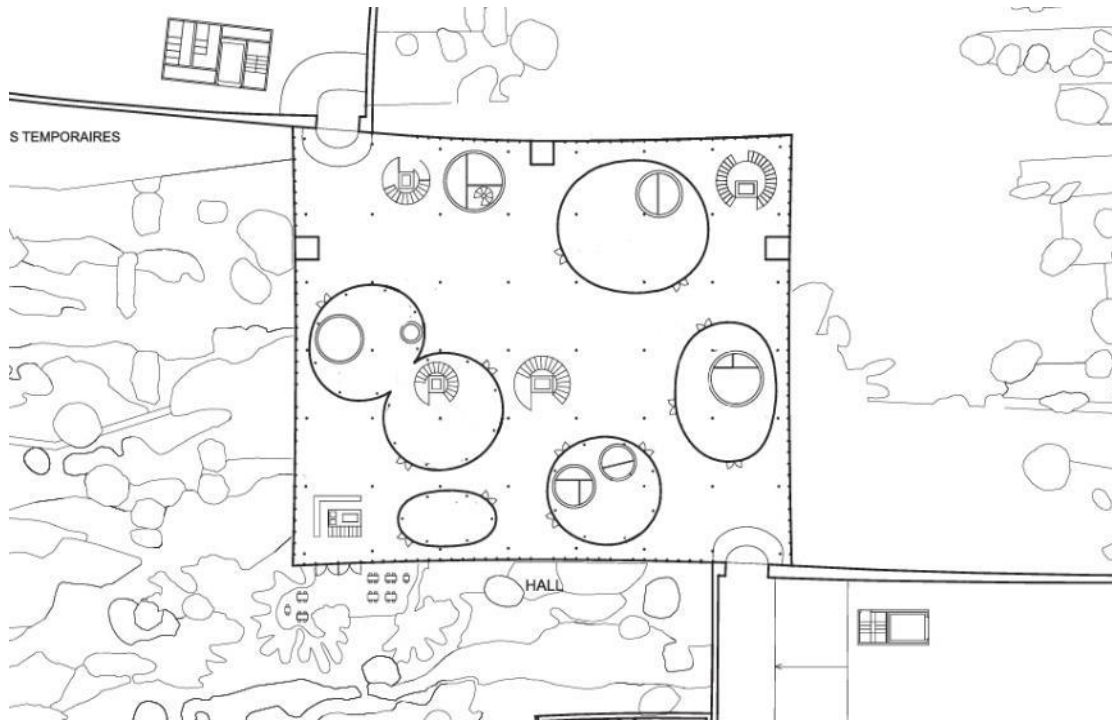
Plan of the Rolex Learning Centre, without furniture (Source: Author)
